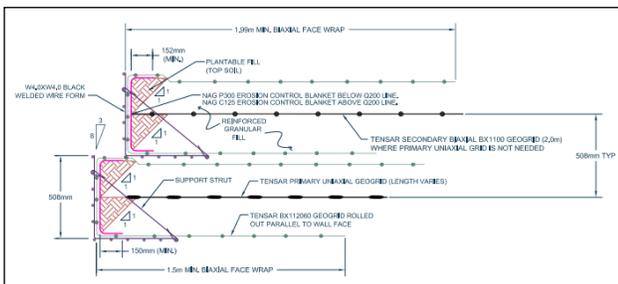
Reinforced Soil Slopes built on soft, compressible soils
